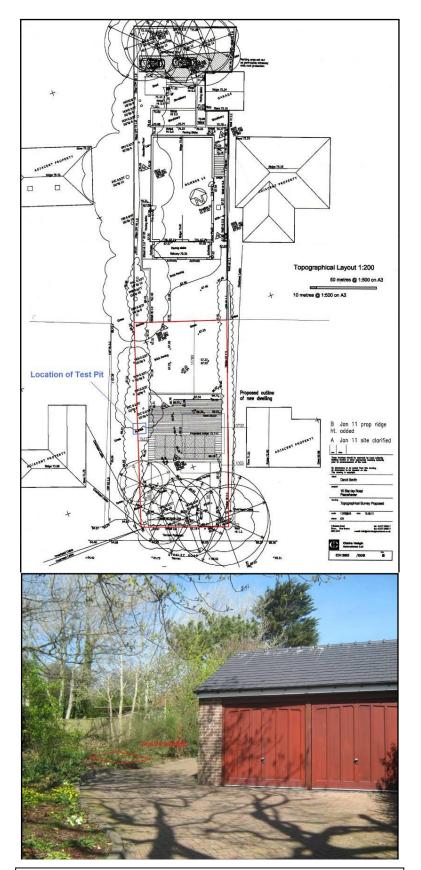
10 Stanley Road, Peacehaven: Site development plan and location of the evaluation trench
